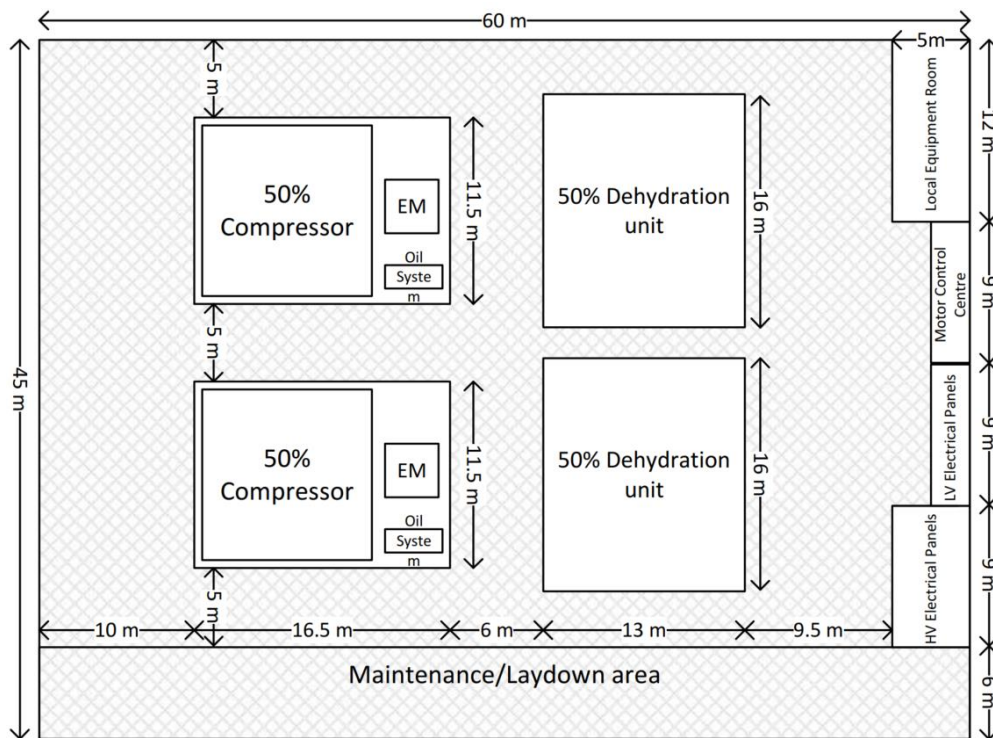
Compression and dehydration plant layout for the 2 x 50% case
